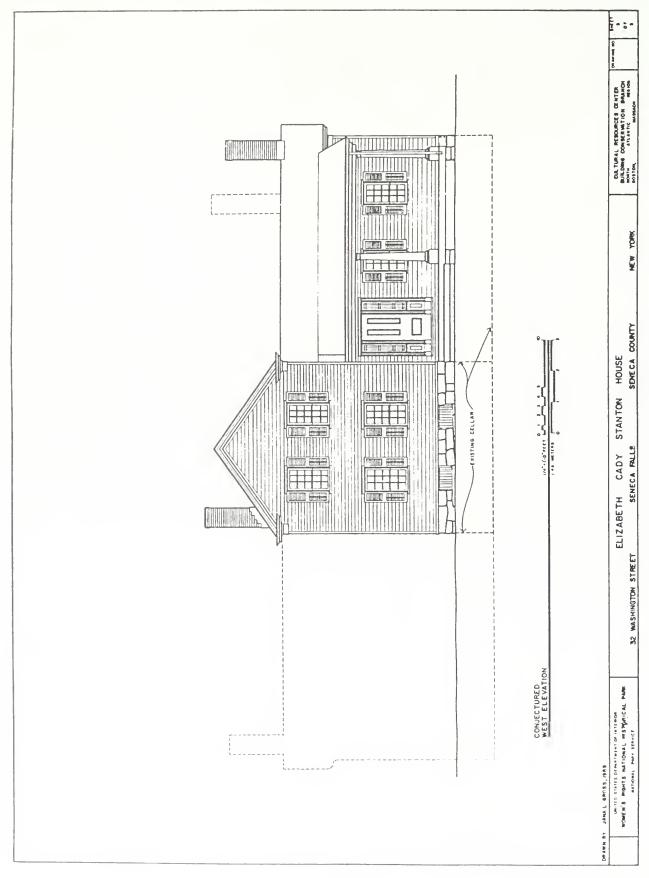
Stanton House: west elevation (conjectural view), circa 1847-62.
